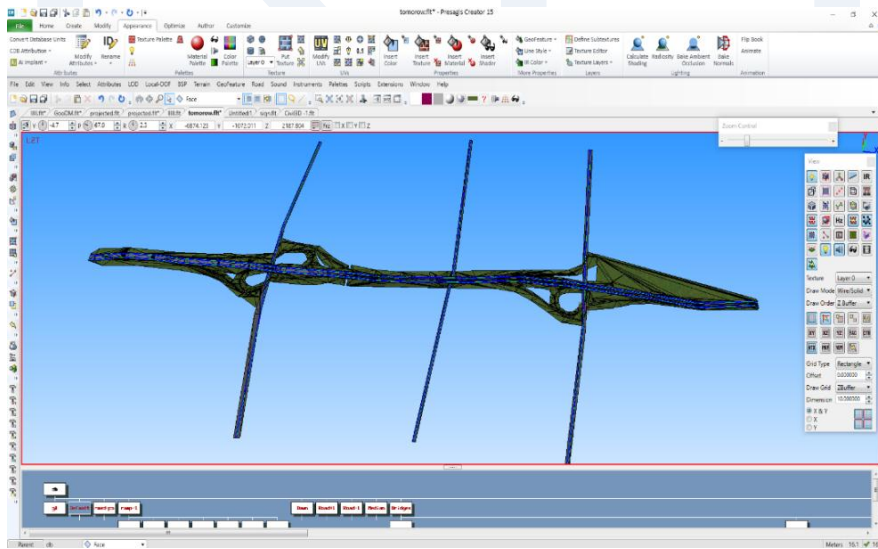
Bridge, ramps, and slope design elements in Creator Pro for the highway segment
